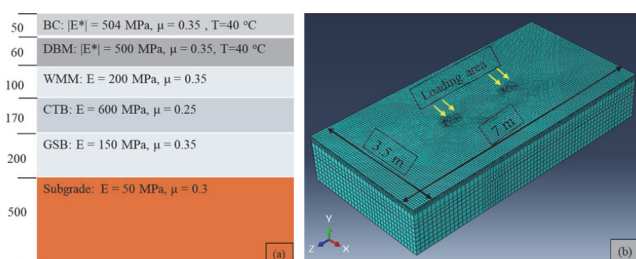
3D FE model of NH pavement section: a) field cross-section and material properties (depth, mm), b) 3D FE model geometry and mesh of the pavement system
